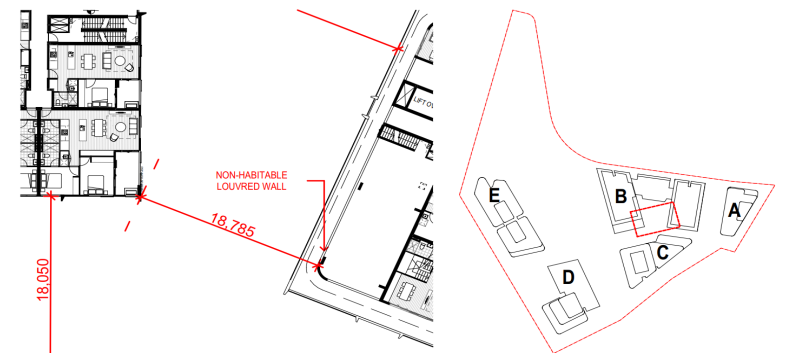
F1.6 Building B separation (storeys 9) & Key Plan
